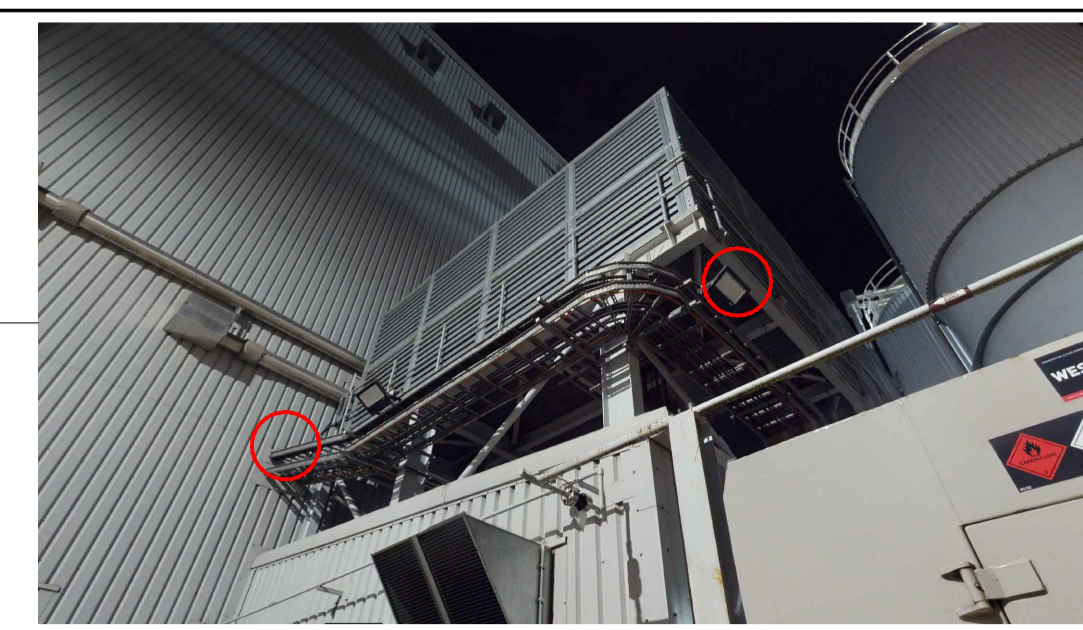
showing floodlights mounted at 7.5m mounted above units on first floor exterior of main processing building
